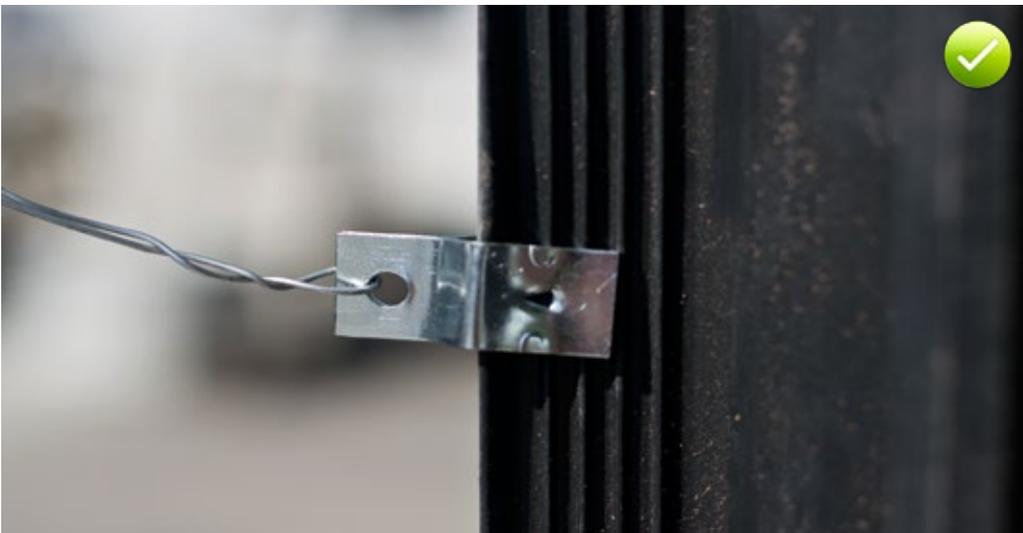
Fixing the crack inducing sealing tube with waterstop clips
